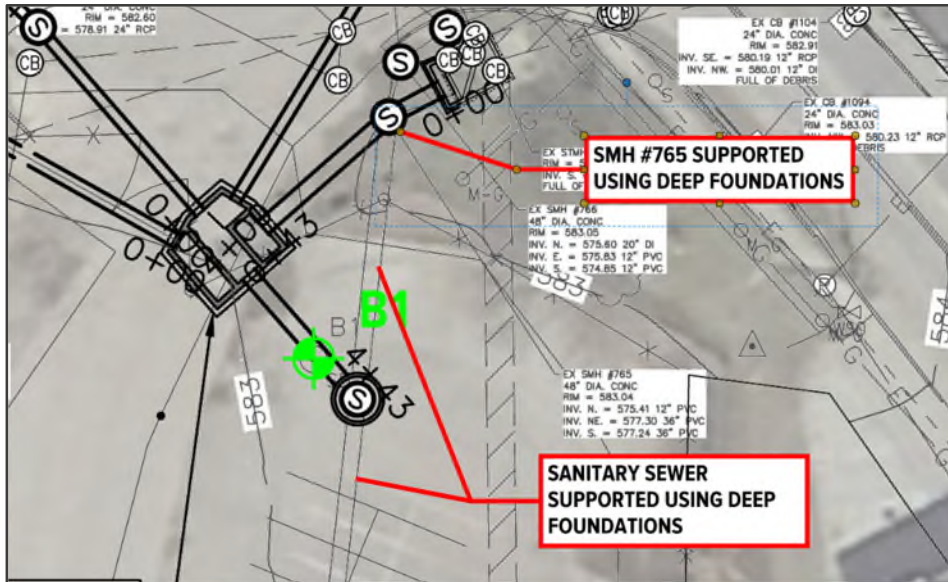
Structure constructed as part of 2017 project supported using deep foundations.
